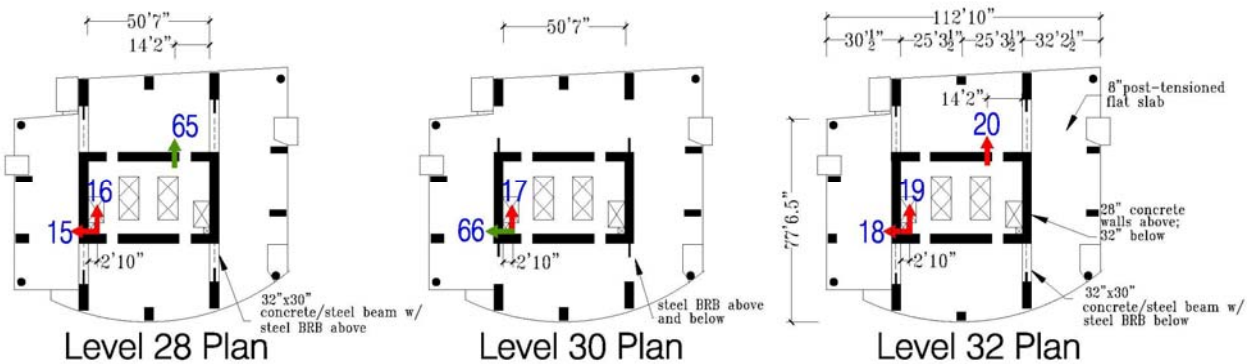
Sensor Locations at Lower Outrigger Frame connections at Levels 28, 30 and 32.
